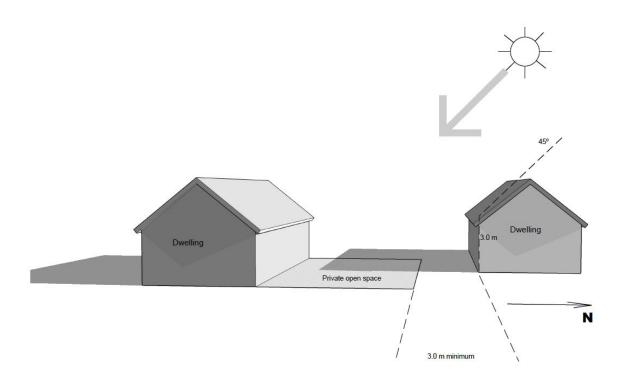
Separation from the private open space of another dwelling on the same site as required by clause 8.4.4 A1(a)
